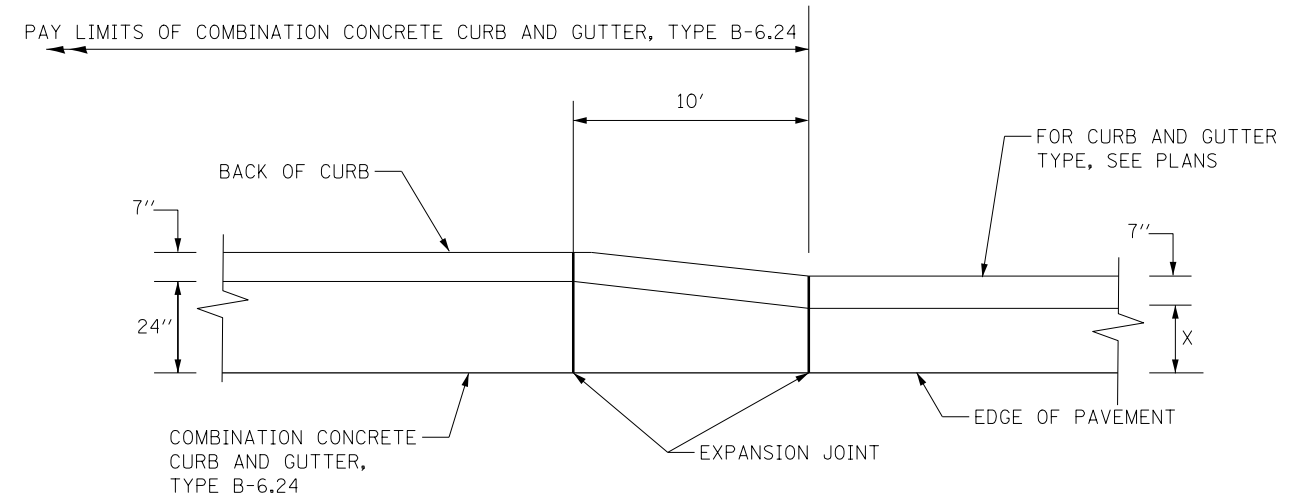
CURB TRANSITION TO TYPE A GUTTER
